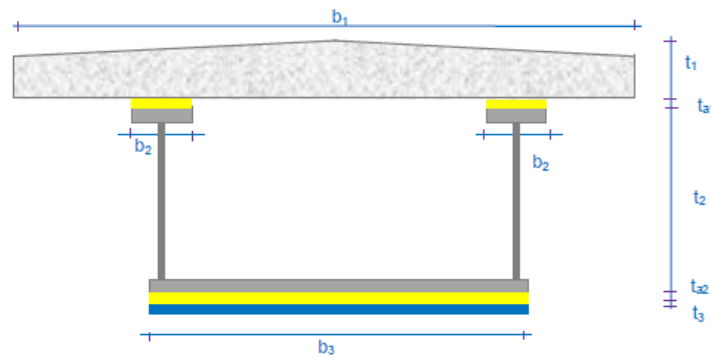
Cross-section of the deck of a composite box girder bridge with perpendicular core 90
